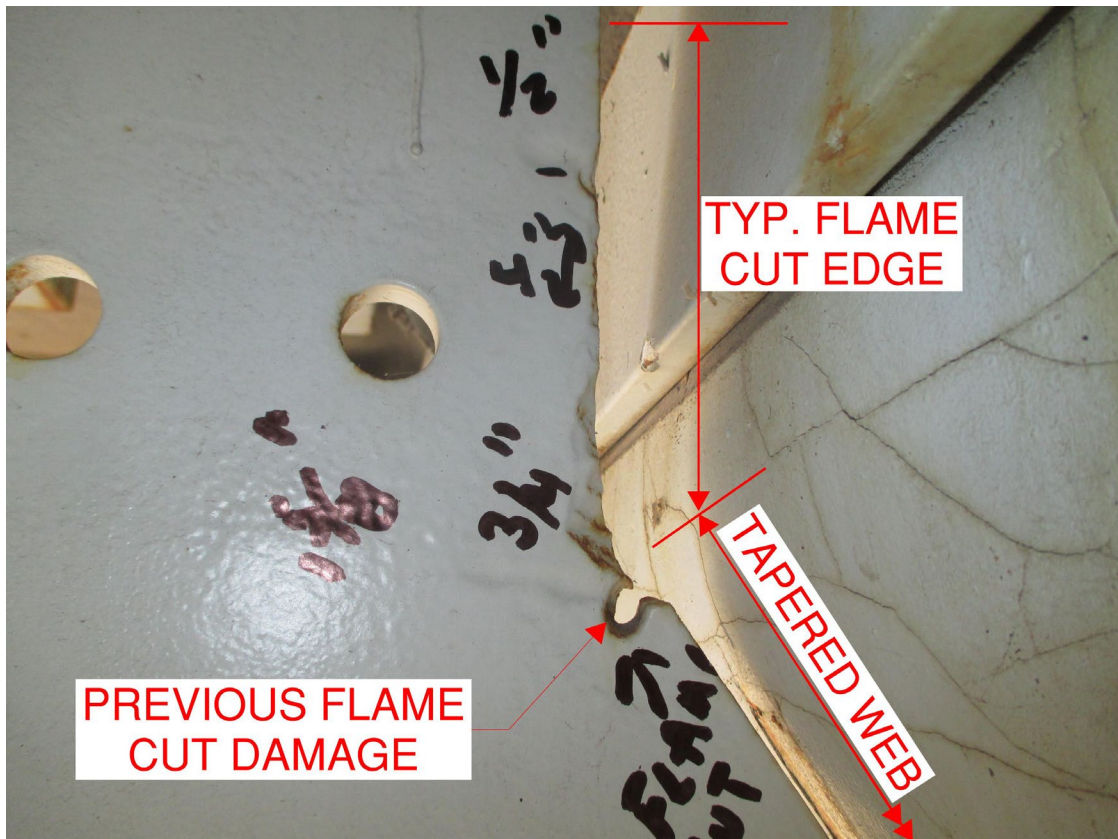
Typical flame-cut edge and flame-cut damage at end of tapered web.
